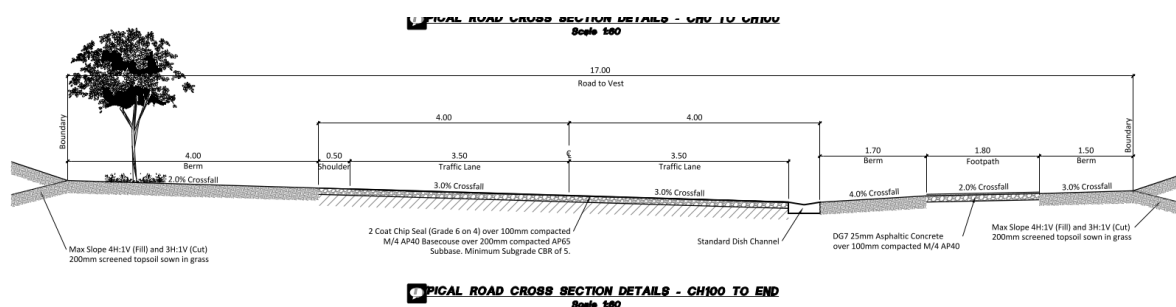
Cross-section for 17-metre-wide road section (Source: Appendix 13 of Application Docs).
